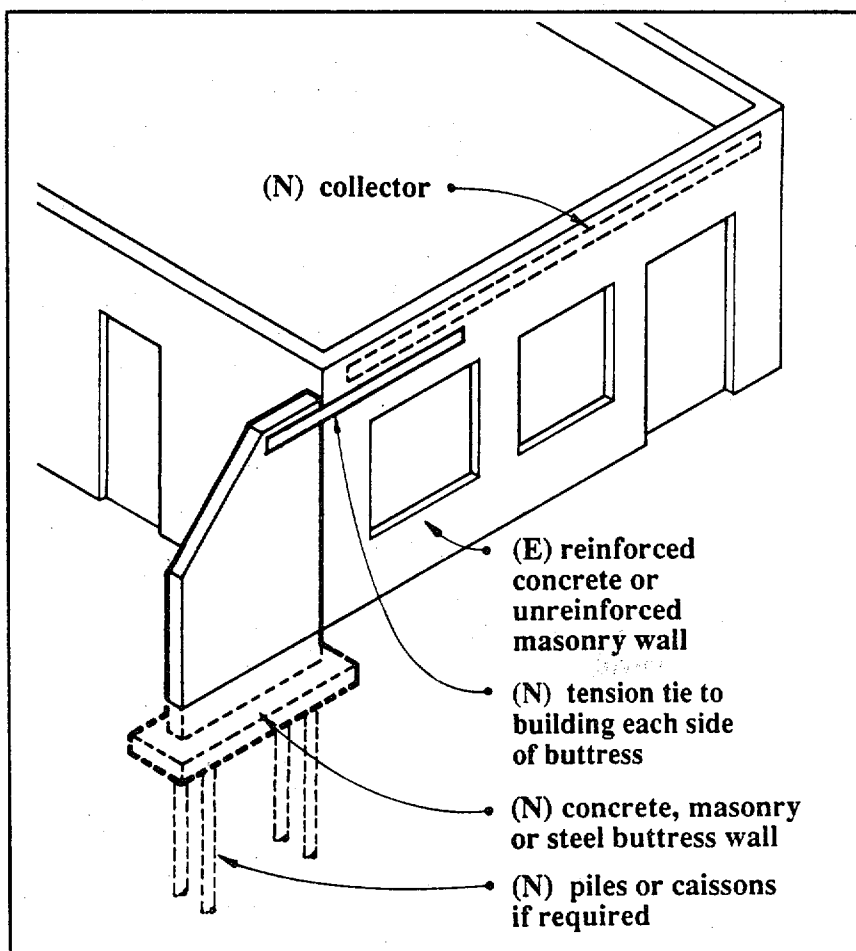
Example of supplemental in-plane strengthening by the addition of an external buttress.
